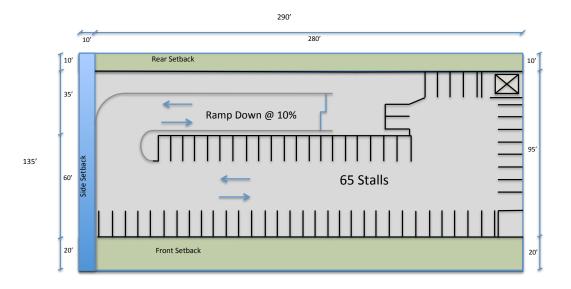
Possible Second Level Layout for Deck on Site 9 or Municipal Dock
